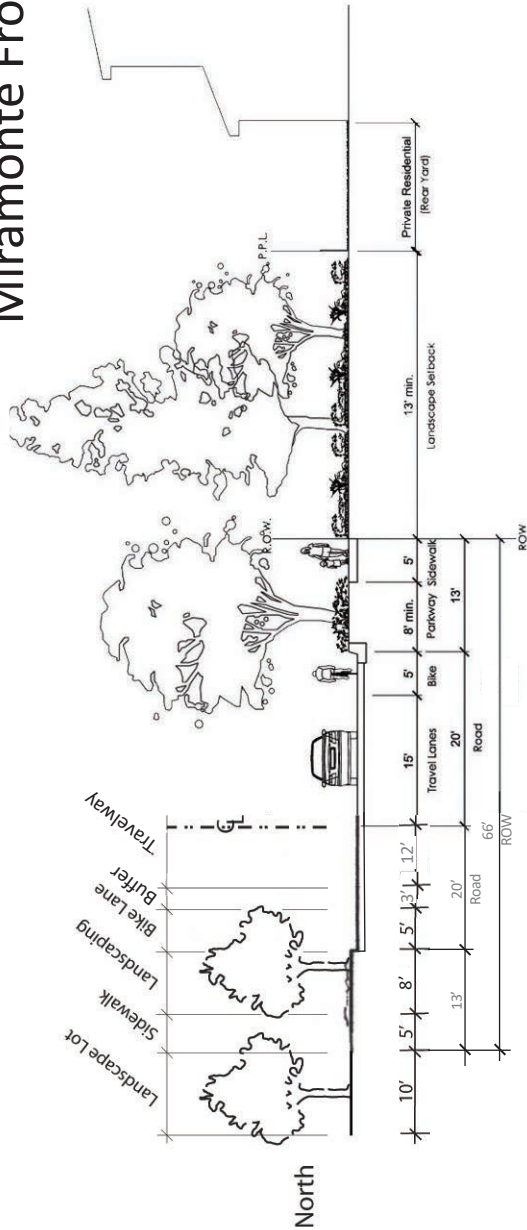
U: ROADWAY SECTIONS FF, HH, & GG
